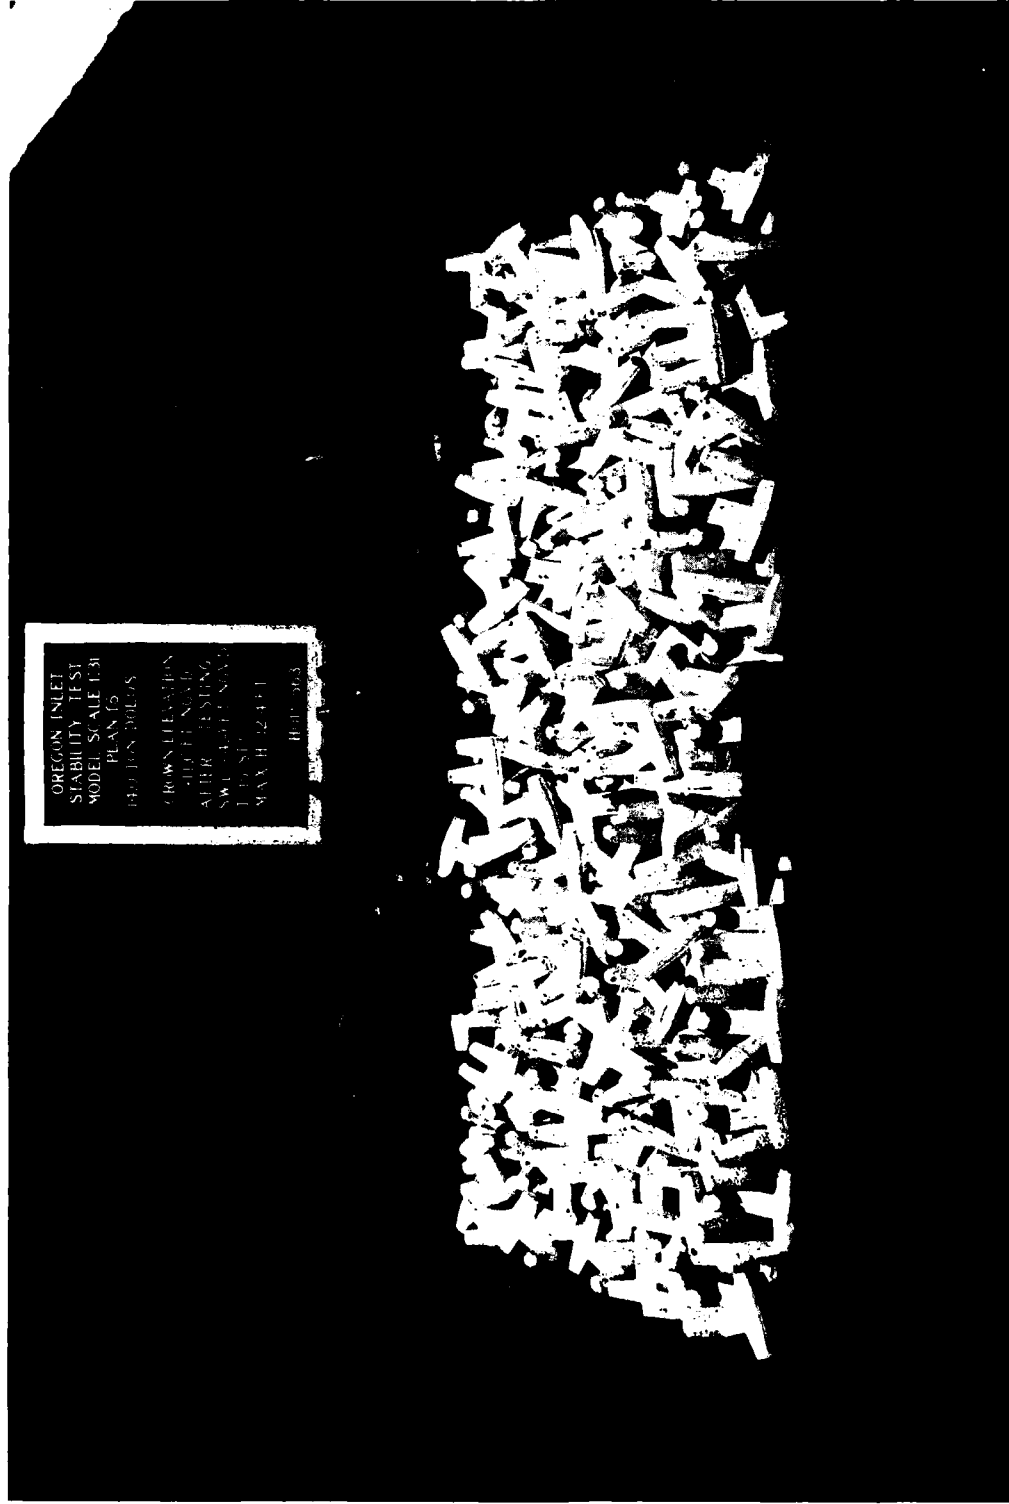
Sea-side view of Plan 15 after testing at swl's of +8, +6, and +4 ft NGVD; maximum wave heights = 16.0, 14.0, and 12.4 ft, respectively
